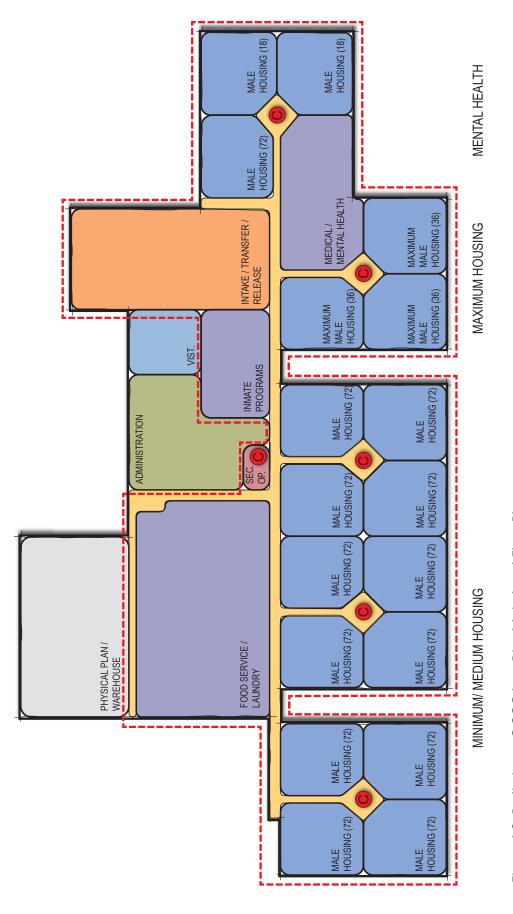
Preliminary OCCC Low-Rise Main Level Floor Plan
